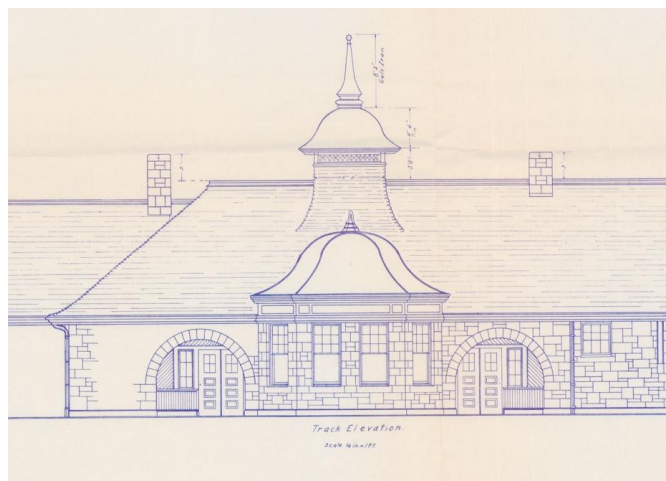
Portion of the original 1890 trackside elevation for the Depot
